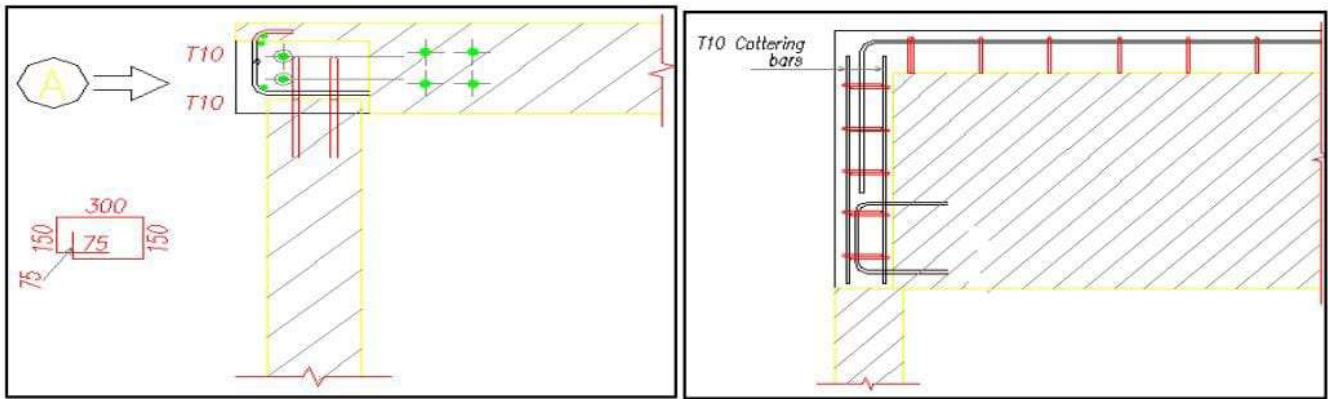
Exterior wall beam connections with cottering bars and topping bars connection.
